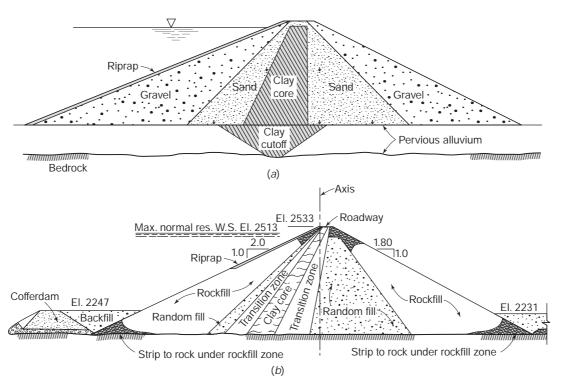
Zoned earth-fill and rock-fill dams: (a) earth-fill dam on pervious alluvium; (b) rock-fill dam on bedrock.
